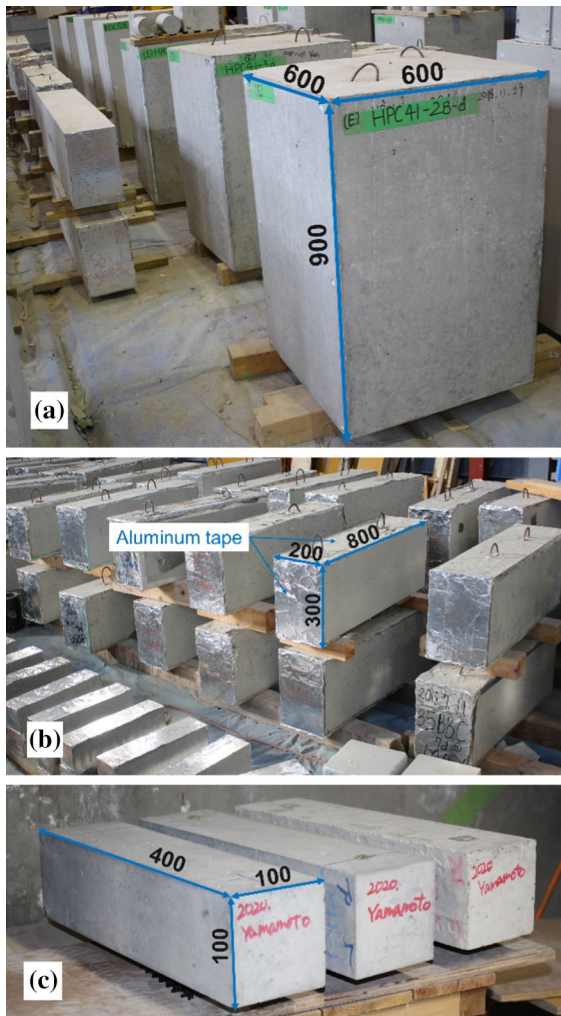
Overview of prismatic specimens (mm): a 600 × 900 × 600 specimens, b 800 × 300 × 200 specimens, and c 400 × 100 × 100 specimens
